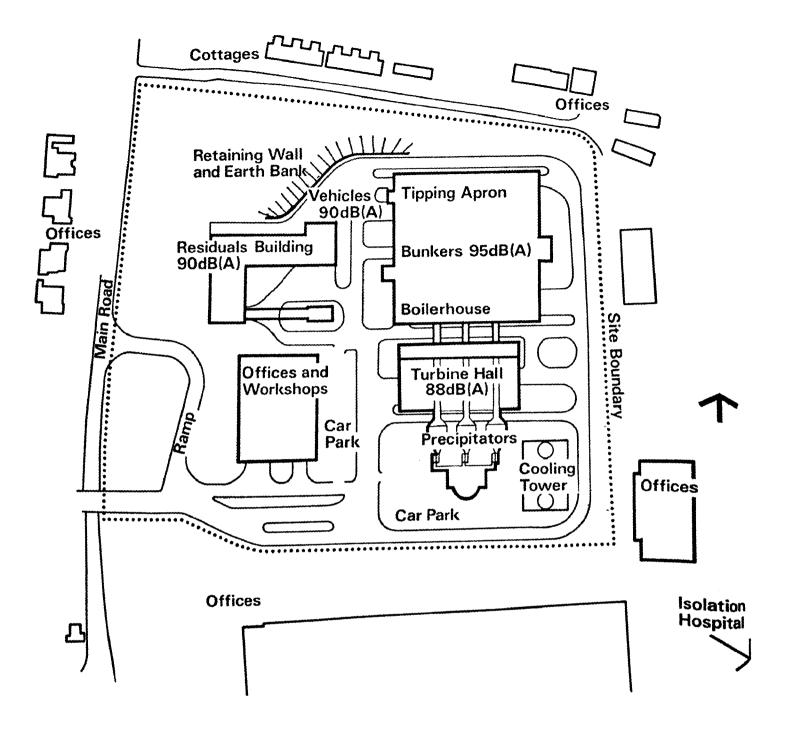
Plan of a refuse-treatment plant designed in accordance with
